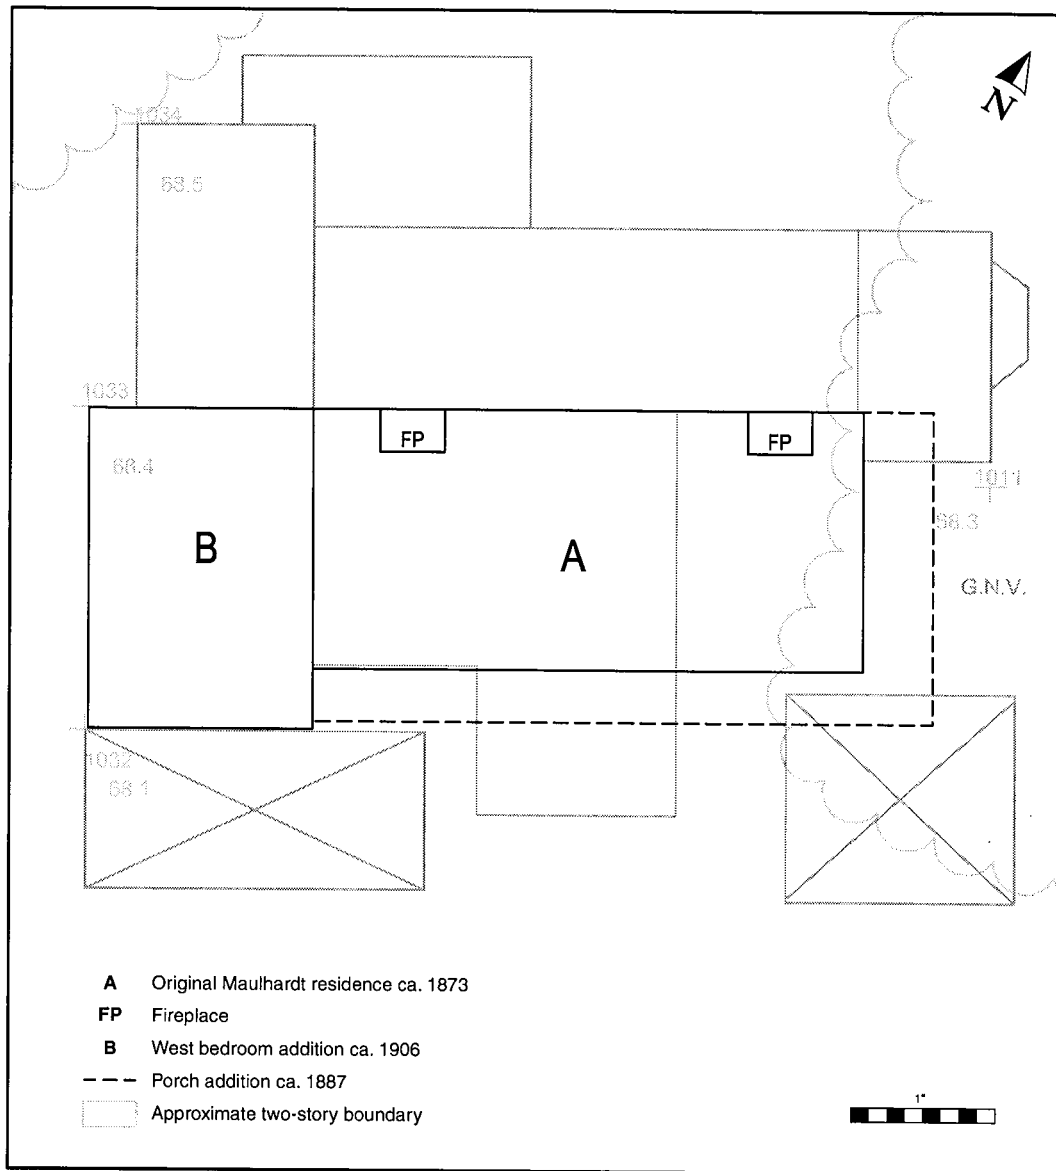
Plan of the original Maulhardt residence, ca. 1873, showing the 1887 porch addition and the west bedroom addition ca. 1906.
